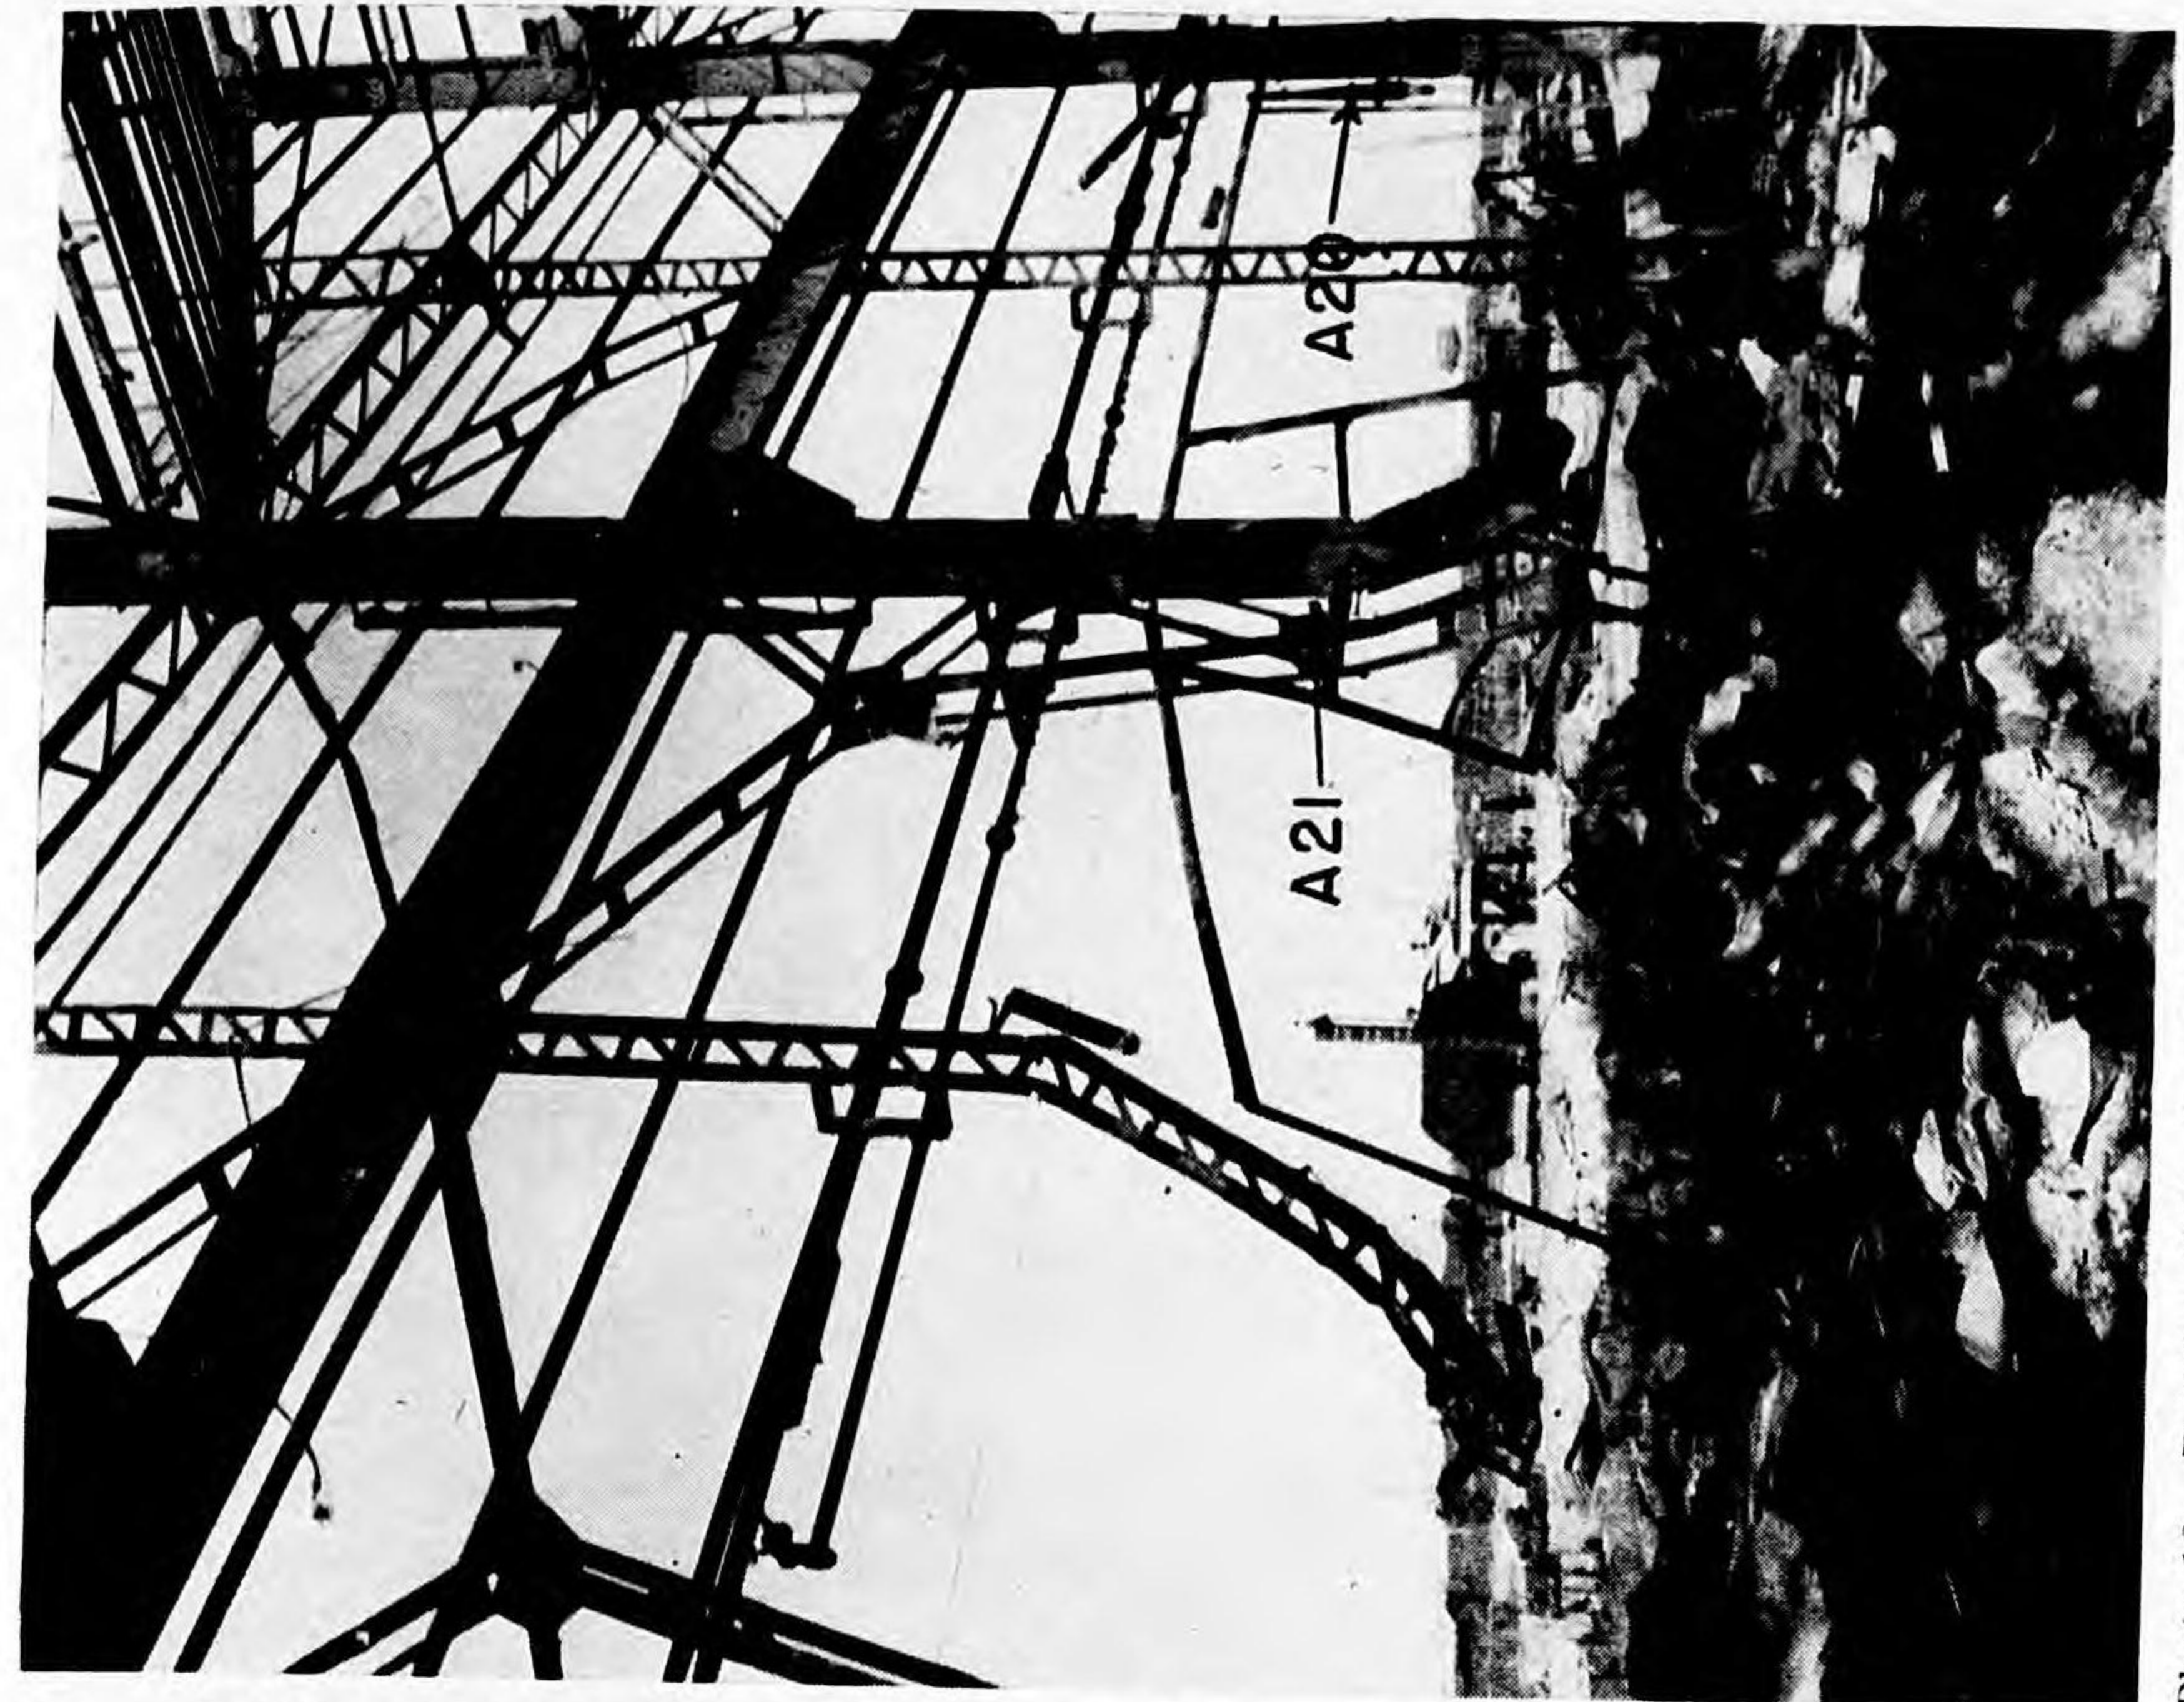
Building 302b; damage to base of Column A21 caused by bomb 3 looking N.
